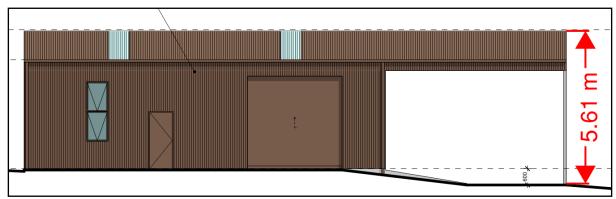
Excerpt of the southern elevation of the proposed outbuilding showing the maximum building height.
